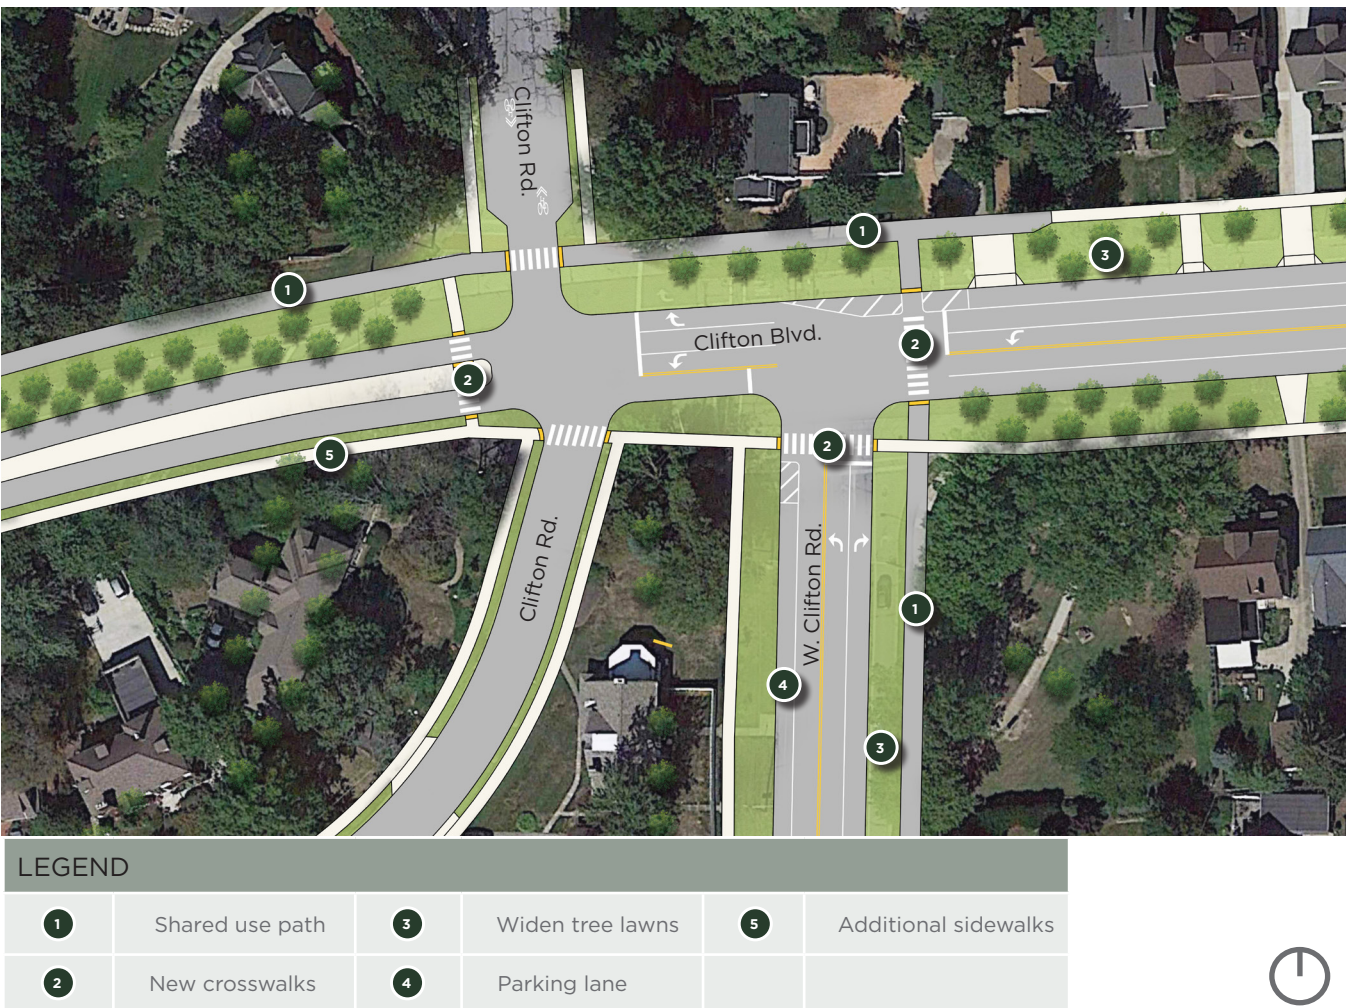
Clifton Boulevard & West Clifton Road Intersection Plan
